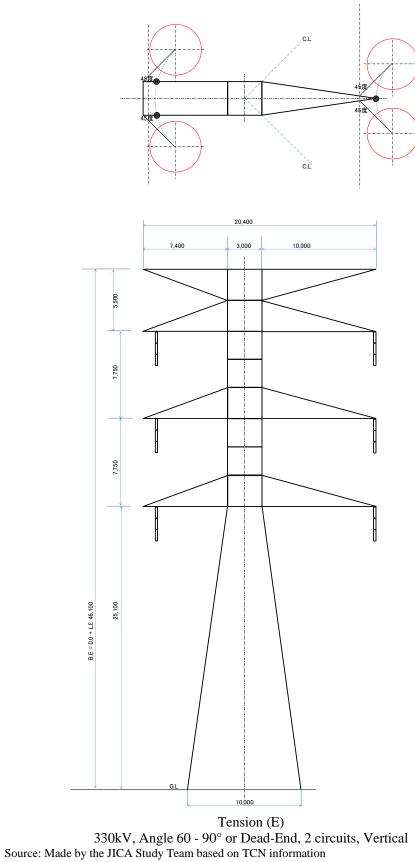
Outline Drawing of the Steel Tower (330kV)
